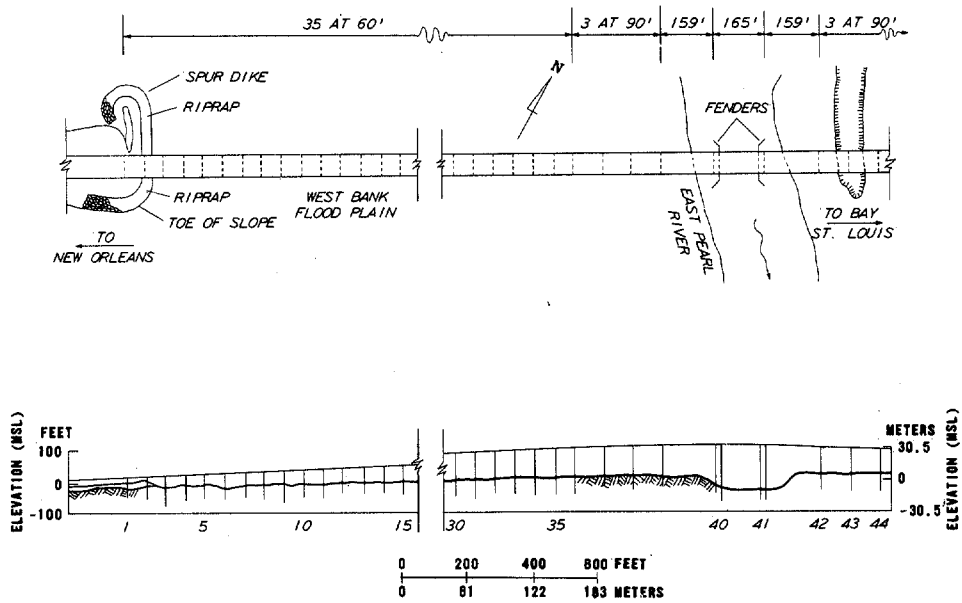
Plan and cross section of I-10 bridge across Pearl River.
